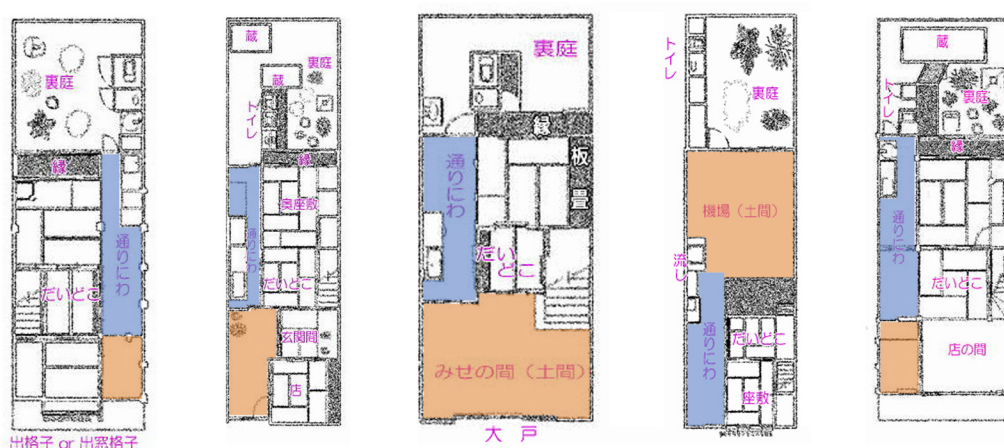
Floorplans of typical Machiya (Inoue, n.d.)
